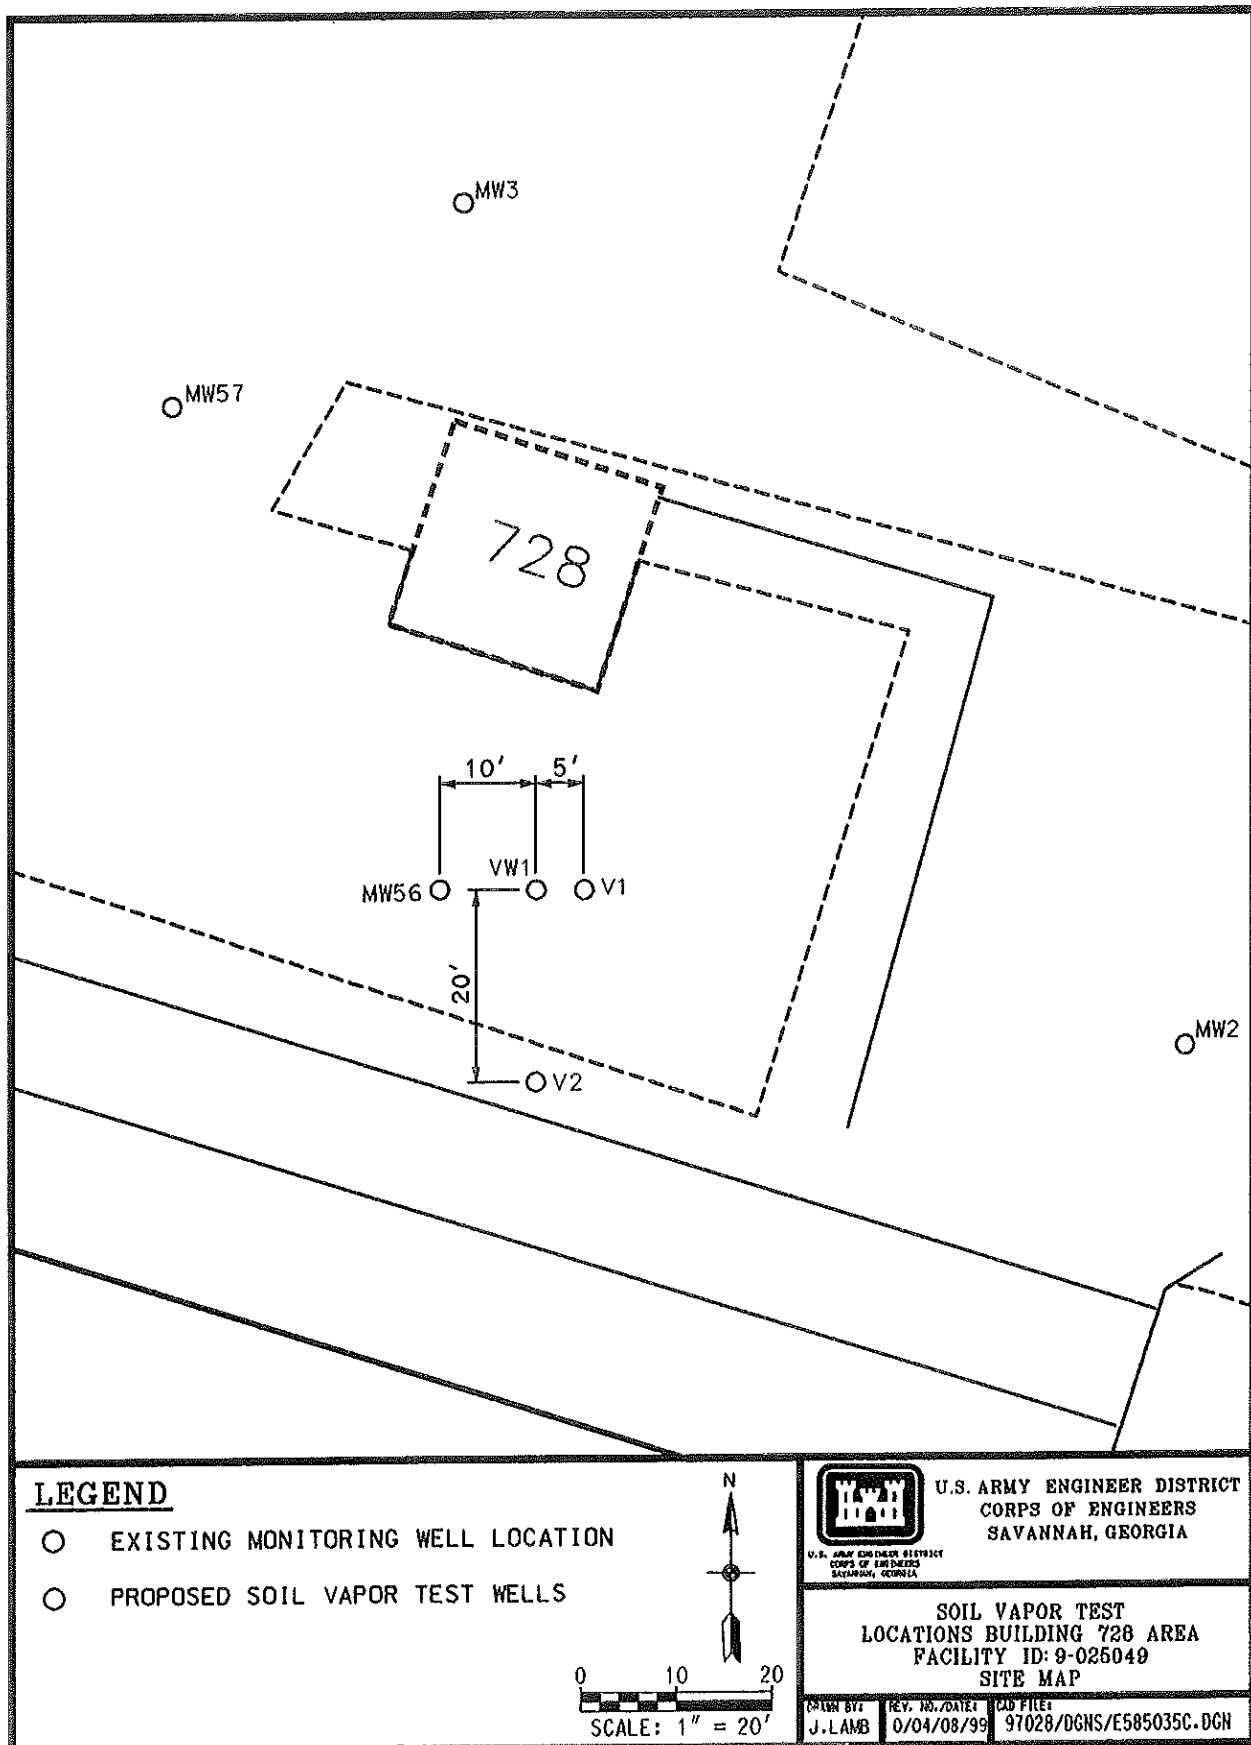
Proposed Locations of Soil Vapor Test Wells for Former Building 728 Site
